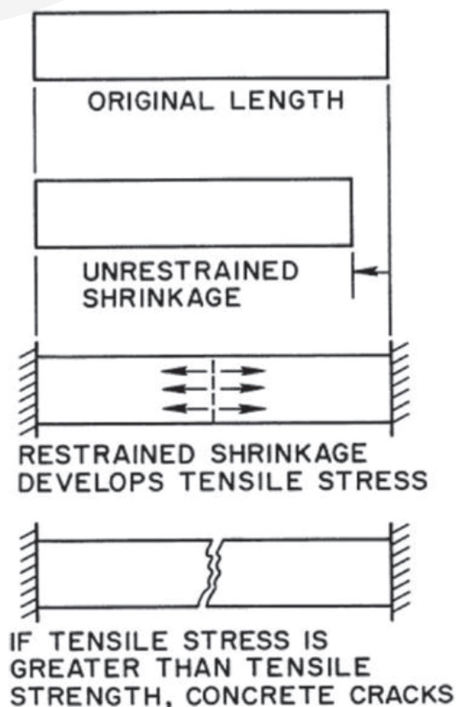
Cracking of concrete due to drying shrinkage (ACI 224R).
